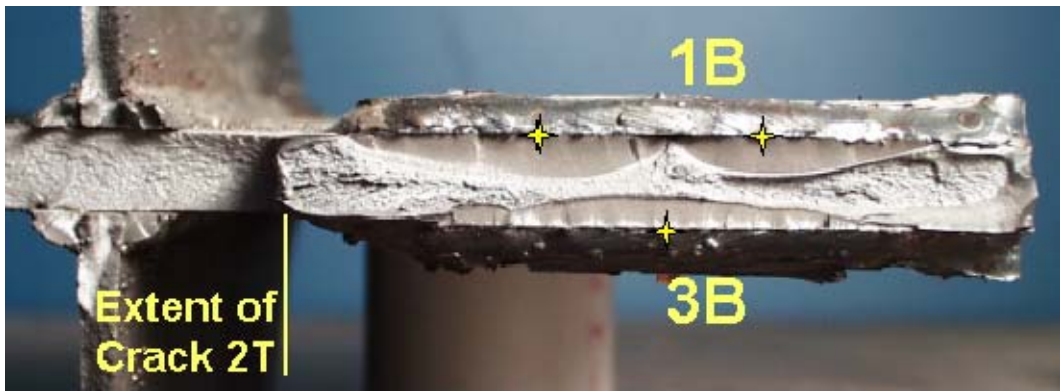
shows fracture surface 1. Note that welds 2T and 4T do not share the same plane as welds 1B and 3B. Fatigue cracks in Figure 4-23 originated from the toe of the stiffener-to-flange weld toe at weld locations 2T and 4T. Fatigue cracks in Figure 4-24 originated from the toe of the stiffener-to-flange weld toe at weld locations 1B and 3B.
